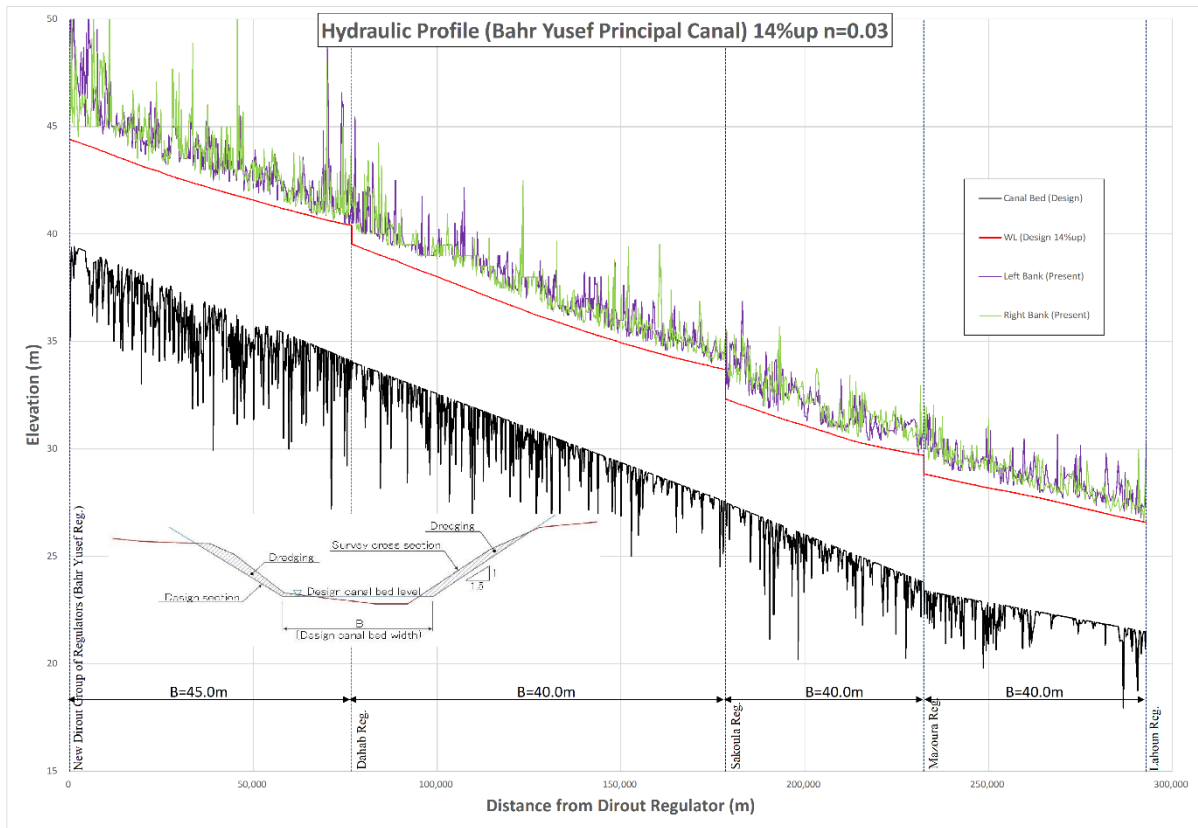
Hydraulic Longitudinal Profile of Bahr Yusef Principal Canal (Maintenance Plan: 14% up)
